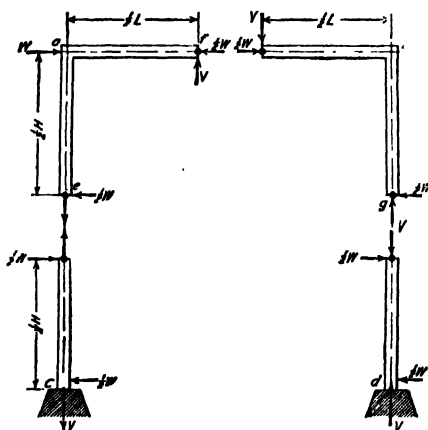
Illustrating wind load and reactions on a stiff bent.
